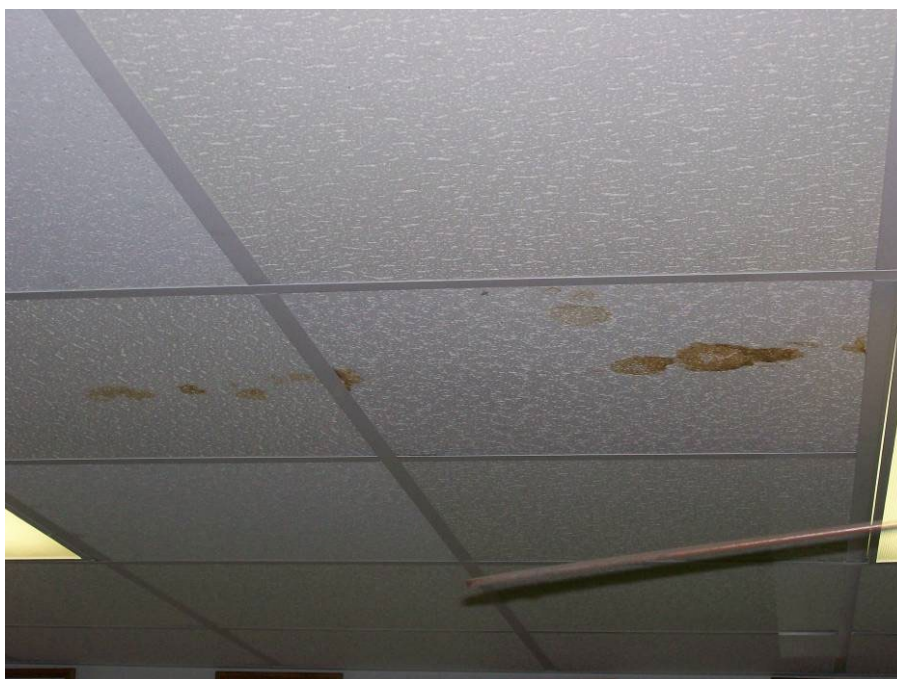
Water Damage to Interior Ceiling of a Fire Station in the Houston Area as a Result of Roof Damage (2008, Hurricane Ike)
